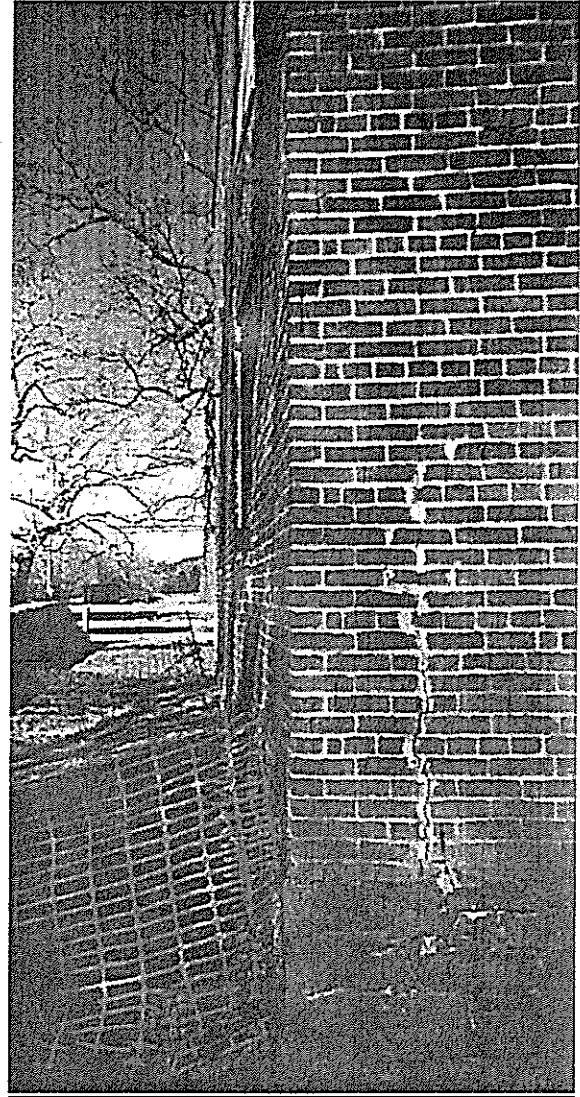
b: Masonry at Southwest. The foundation is comprised of locally-obtained basalt cobbles, and soft, sandy mortar. The shrinking and expansion cycles of the clay upon which the foundation is laid have caused foundation movement. Two large vertical cracks at the west ends of the north and south walls show that the foundation movement is affecting the brick masonry walls above. (Photo taken: 4/97)
